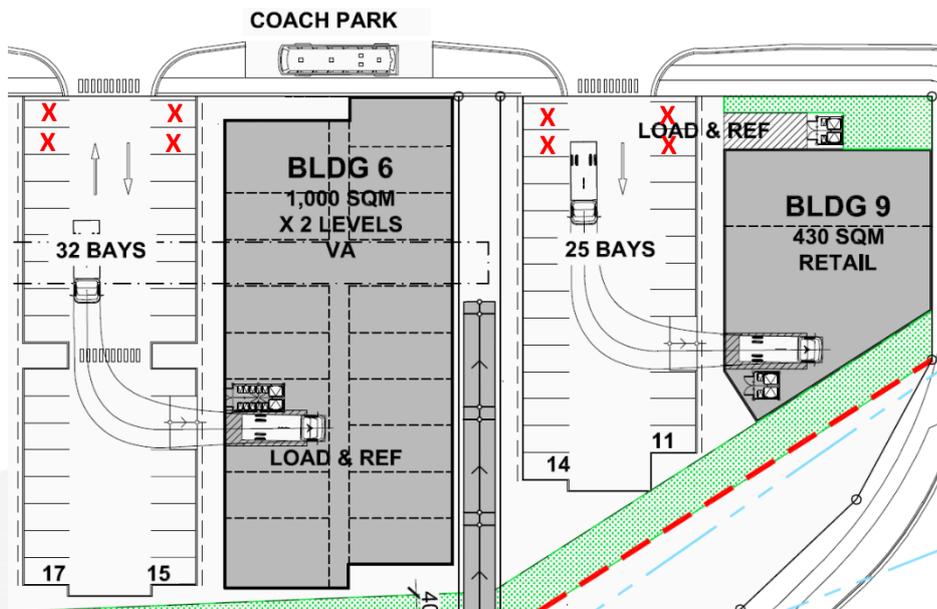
Parking Spaces to be Removed to Create Queuing Space
